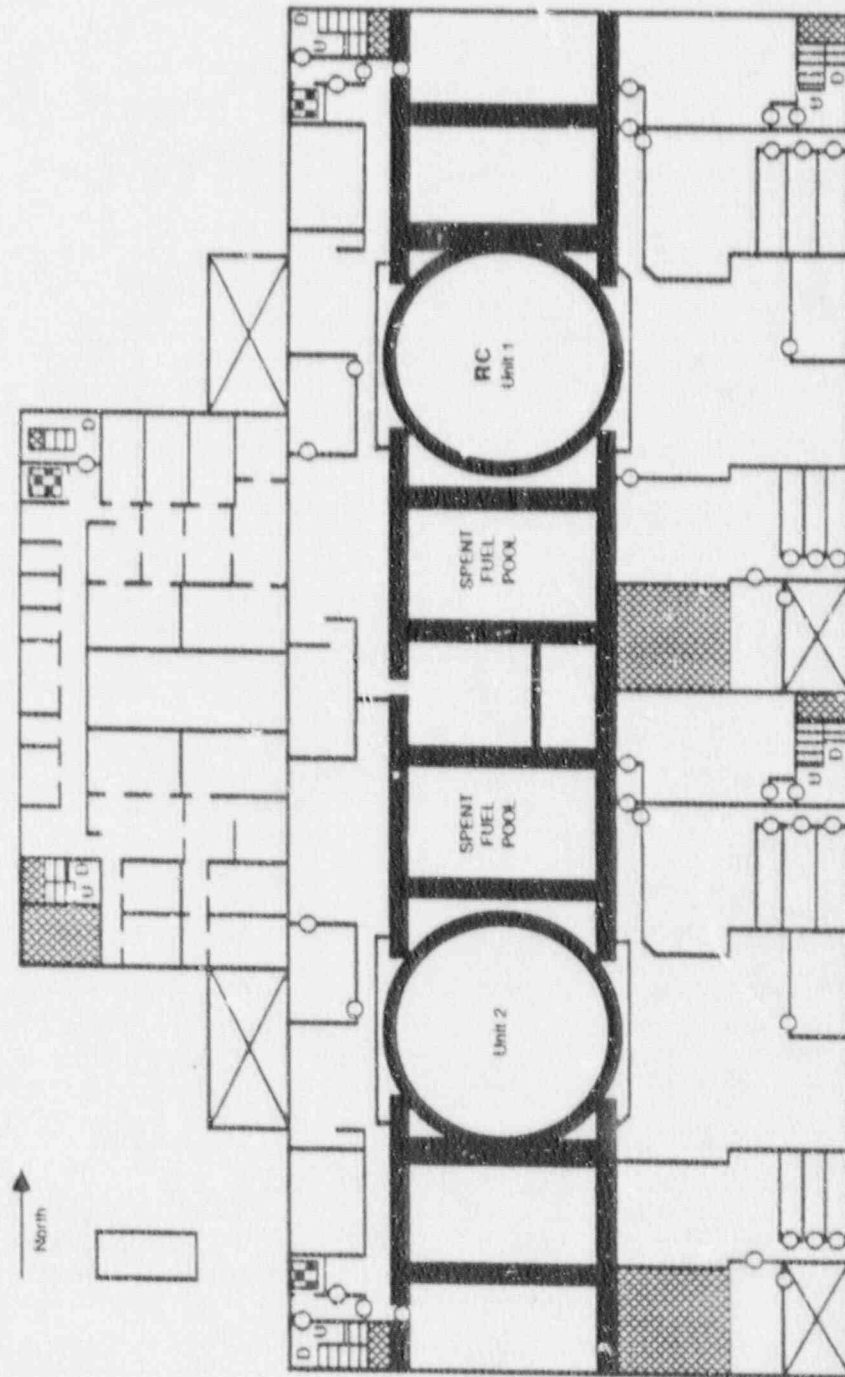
Susquehanna 1 and 2 Reactor Building, Elevation 749' and Control Building, Elevation 753'
